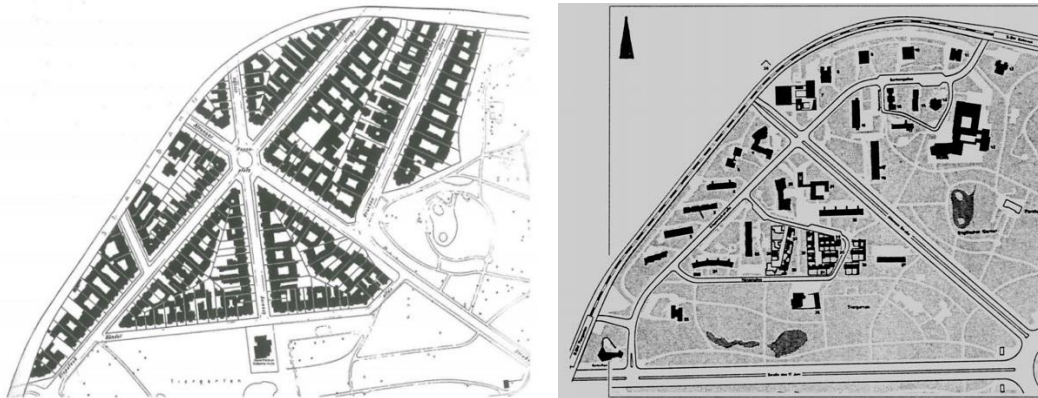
Hansavietel site plan, left: before WWII destructions, right: after Interbau exhibition reconstructions.
